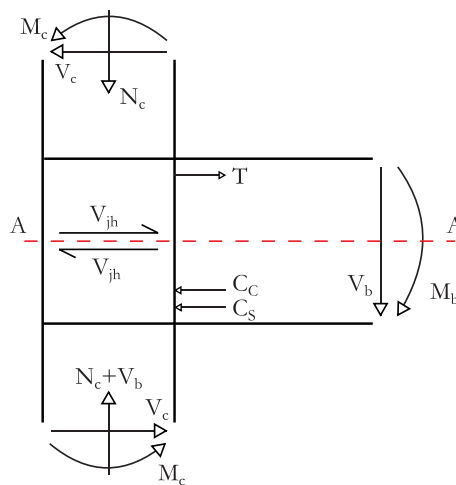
Forces acting within an exterior beam-column joint subassembly.
